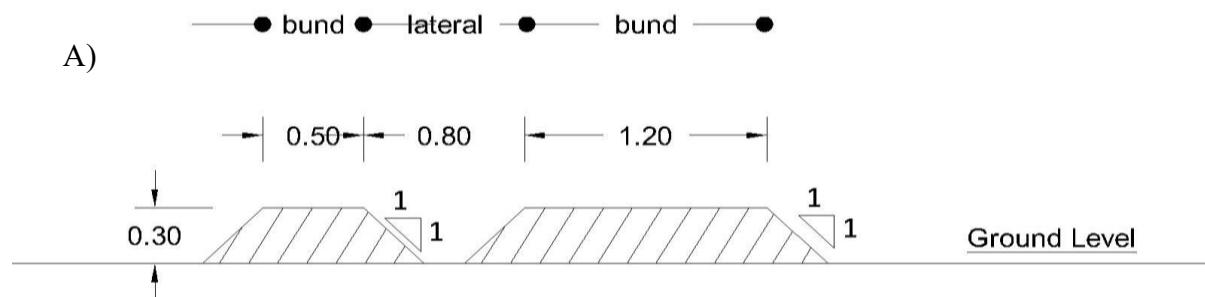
Cross-Sections of Lateral Embankment: Without Road
